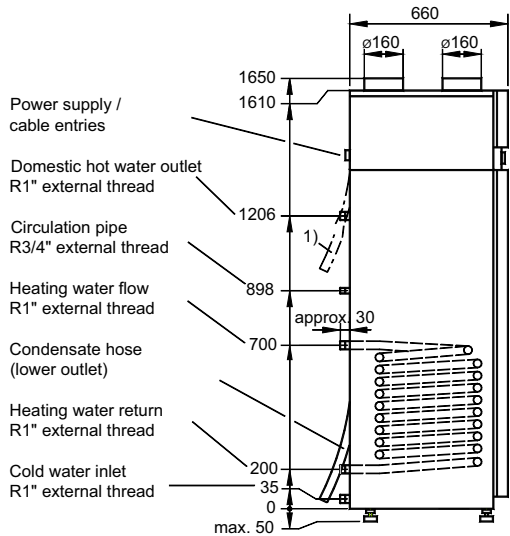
Connections and dimensions of the domestic hot water heat pump equipped with an auxiliary internal heat exchanger
